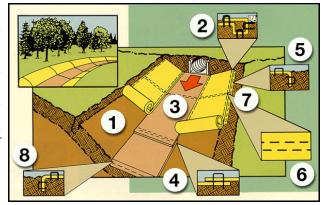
Example erosion control mat installation in a channel or drainage swale (North American Green, 2002).
